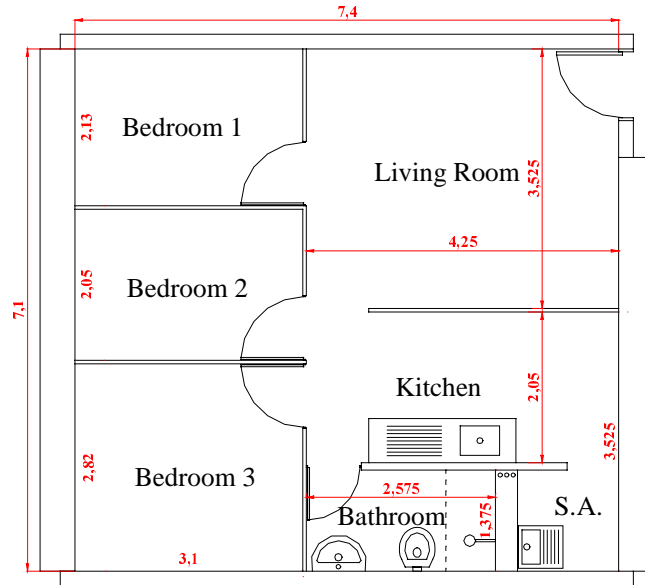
CECAP's standard apartment architectural plant. Measures in meter (m).
